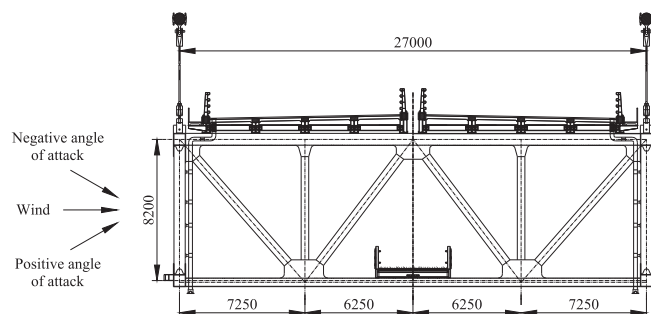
Outline of the steel truss stiffening girder (unit: mm).
